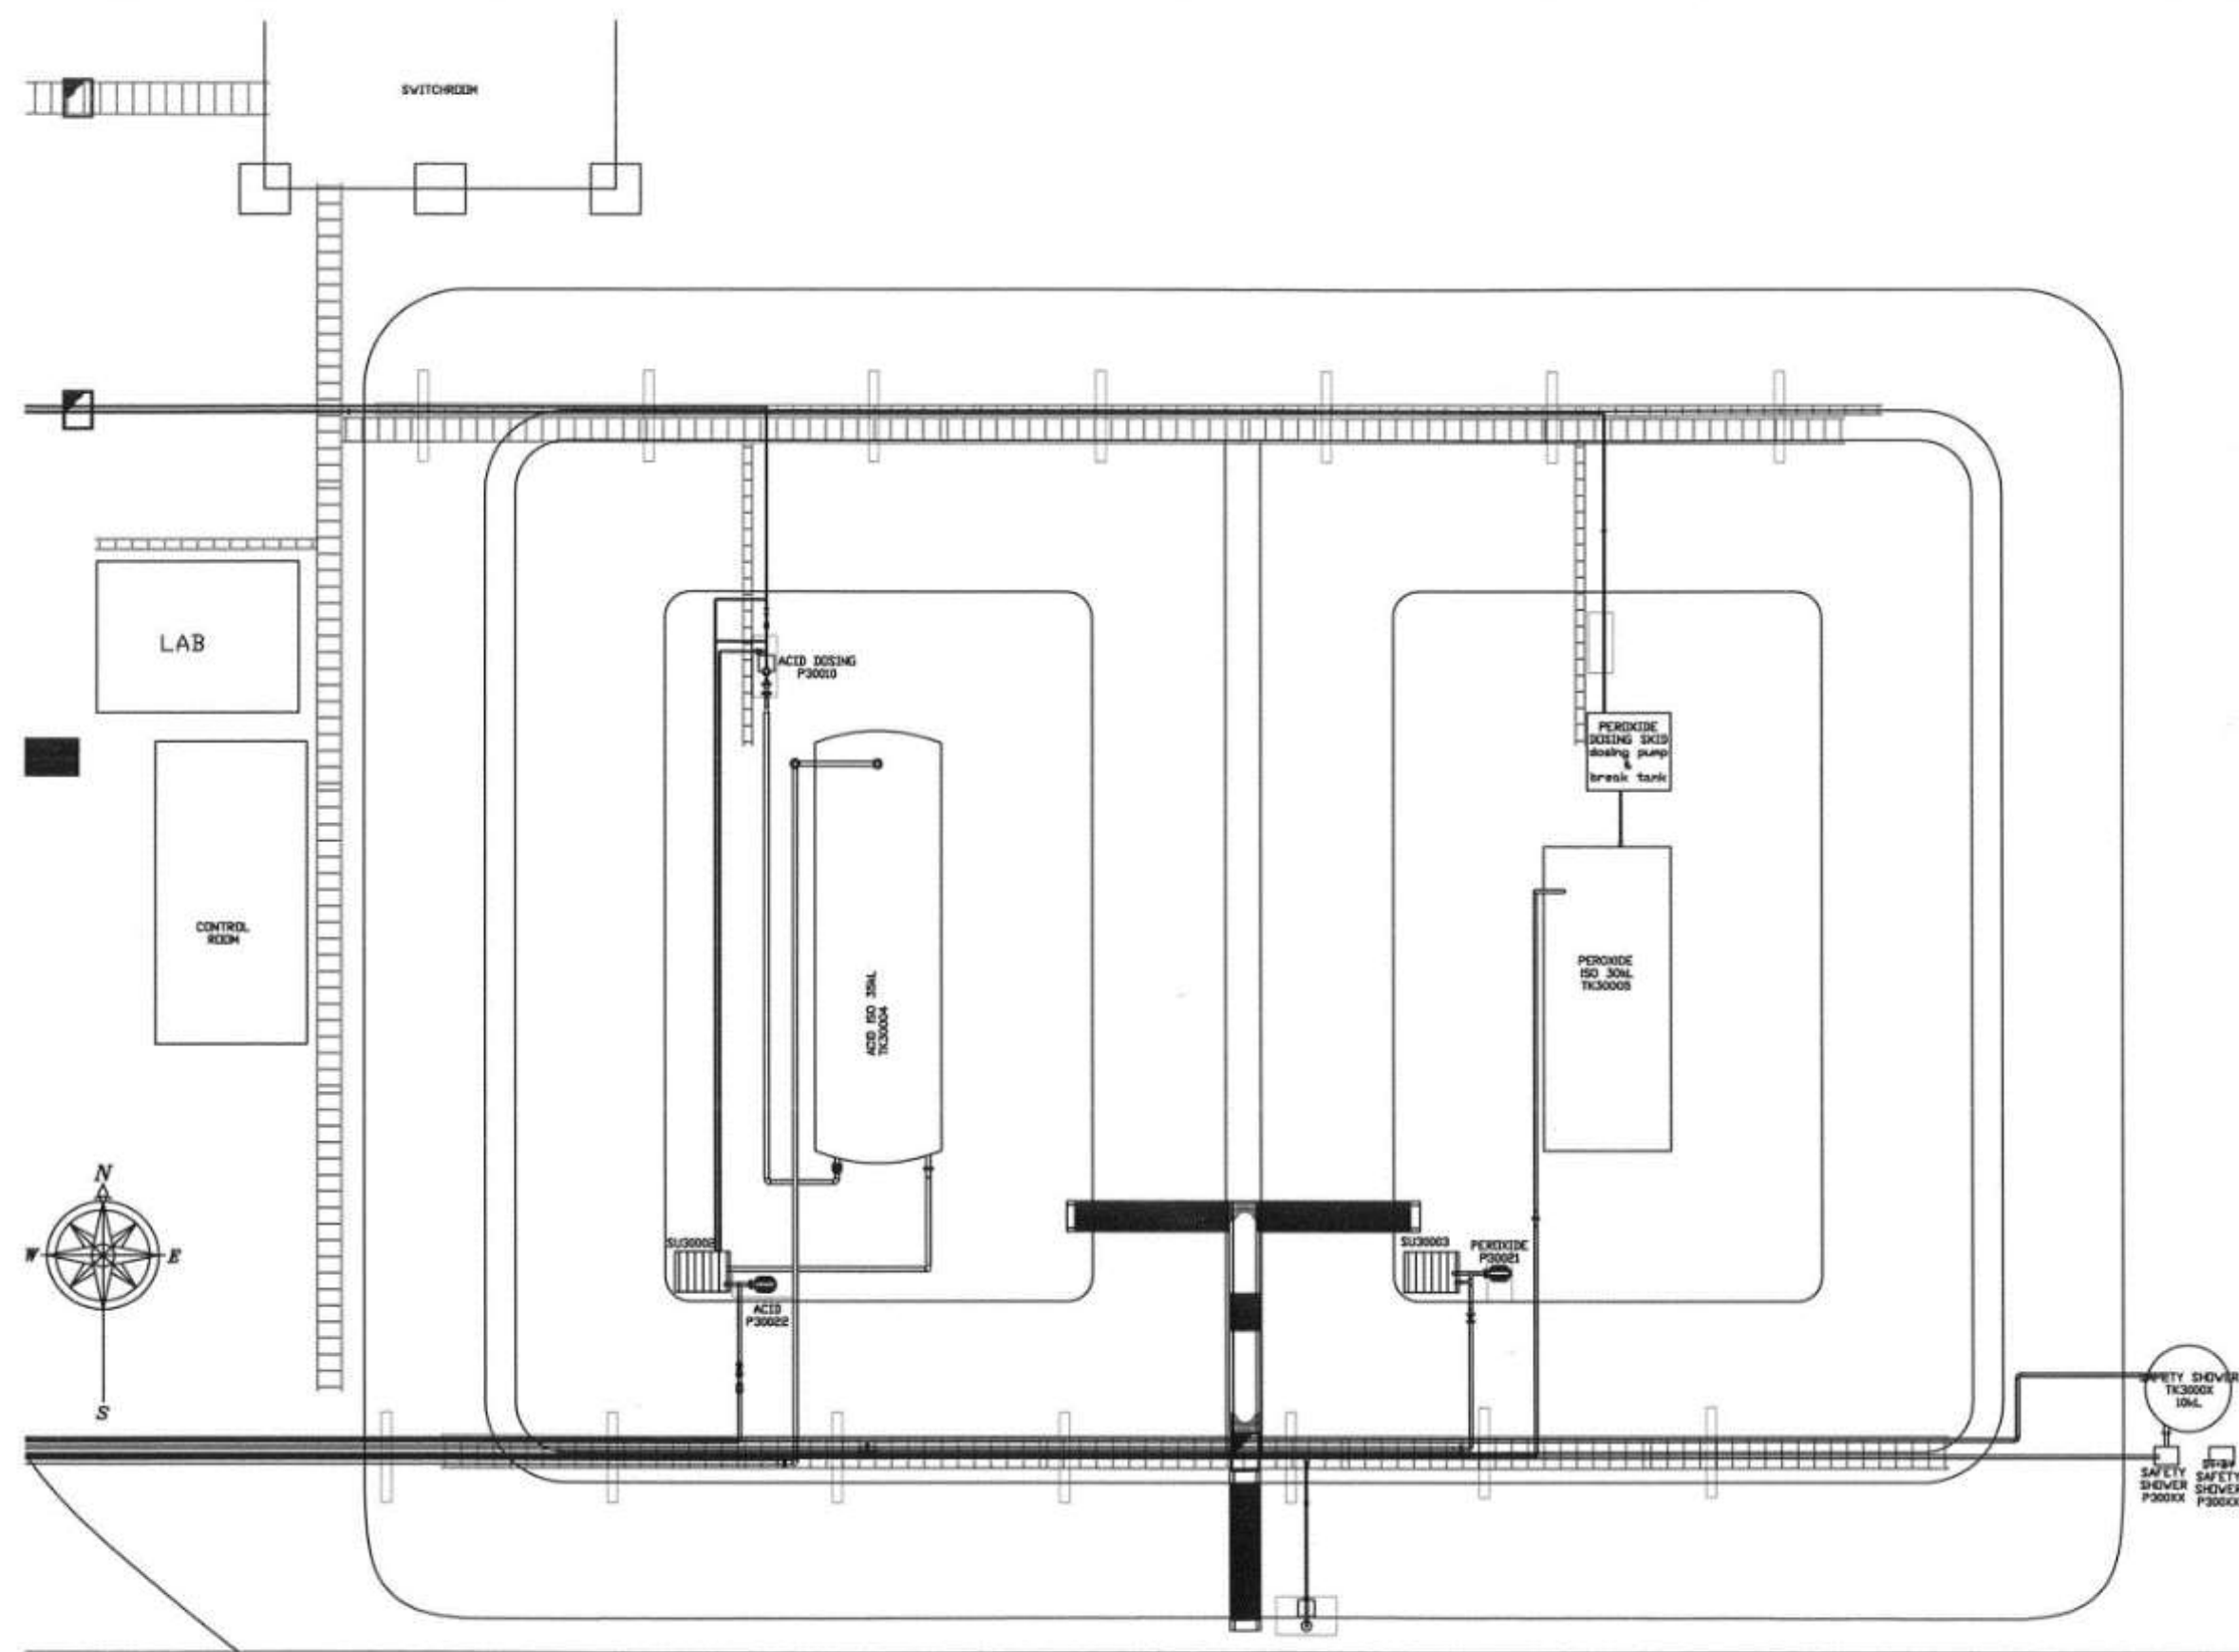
Pepegoona Satellite Plant Site Layout – bunded reagent area
